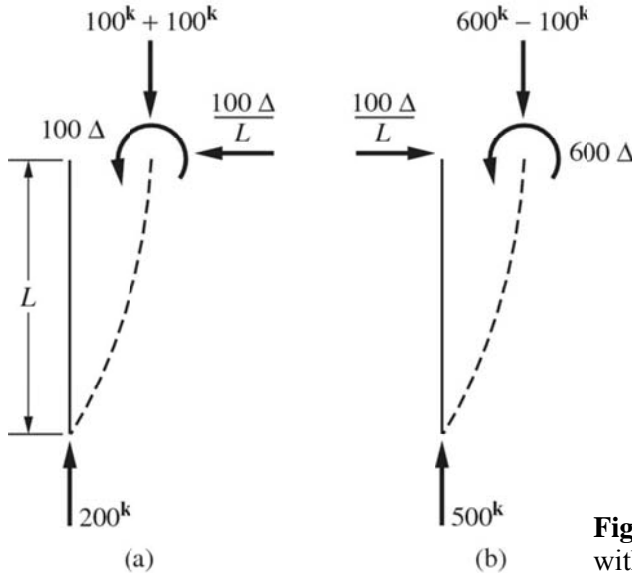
Columns from Unbraced Frame with Revised Loading.
